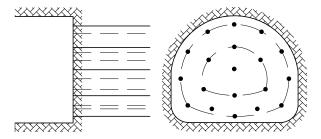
Schematic showing a typical arrangement of dowels used in the tunnel face (after ITA/AITES 2007)
